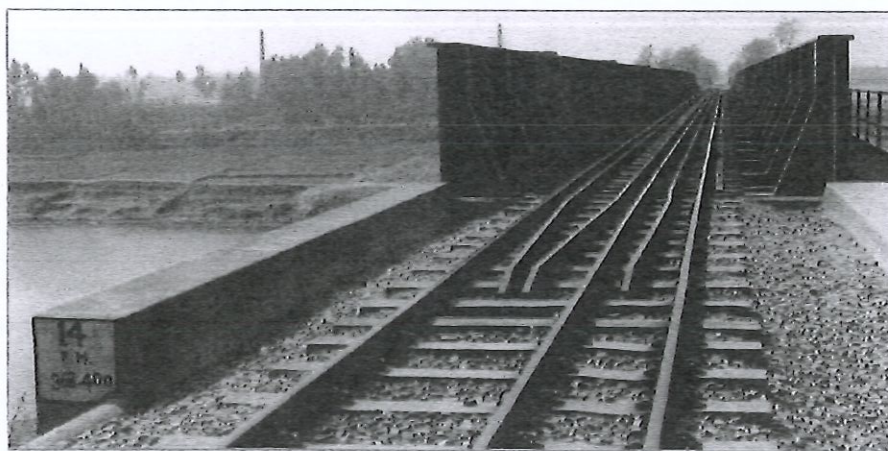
Bridge No. 14 Existing Steel Semi through Plate Girder Bridge (STPG)
